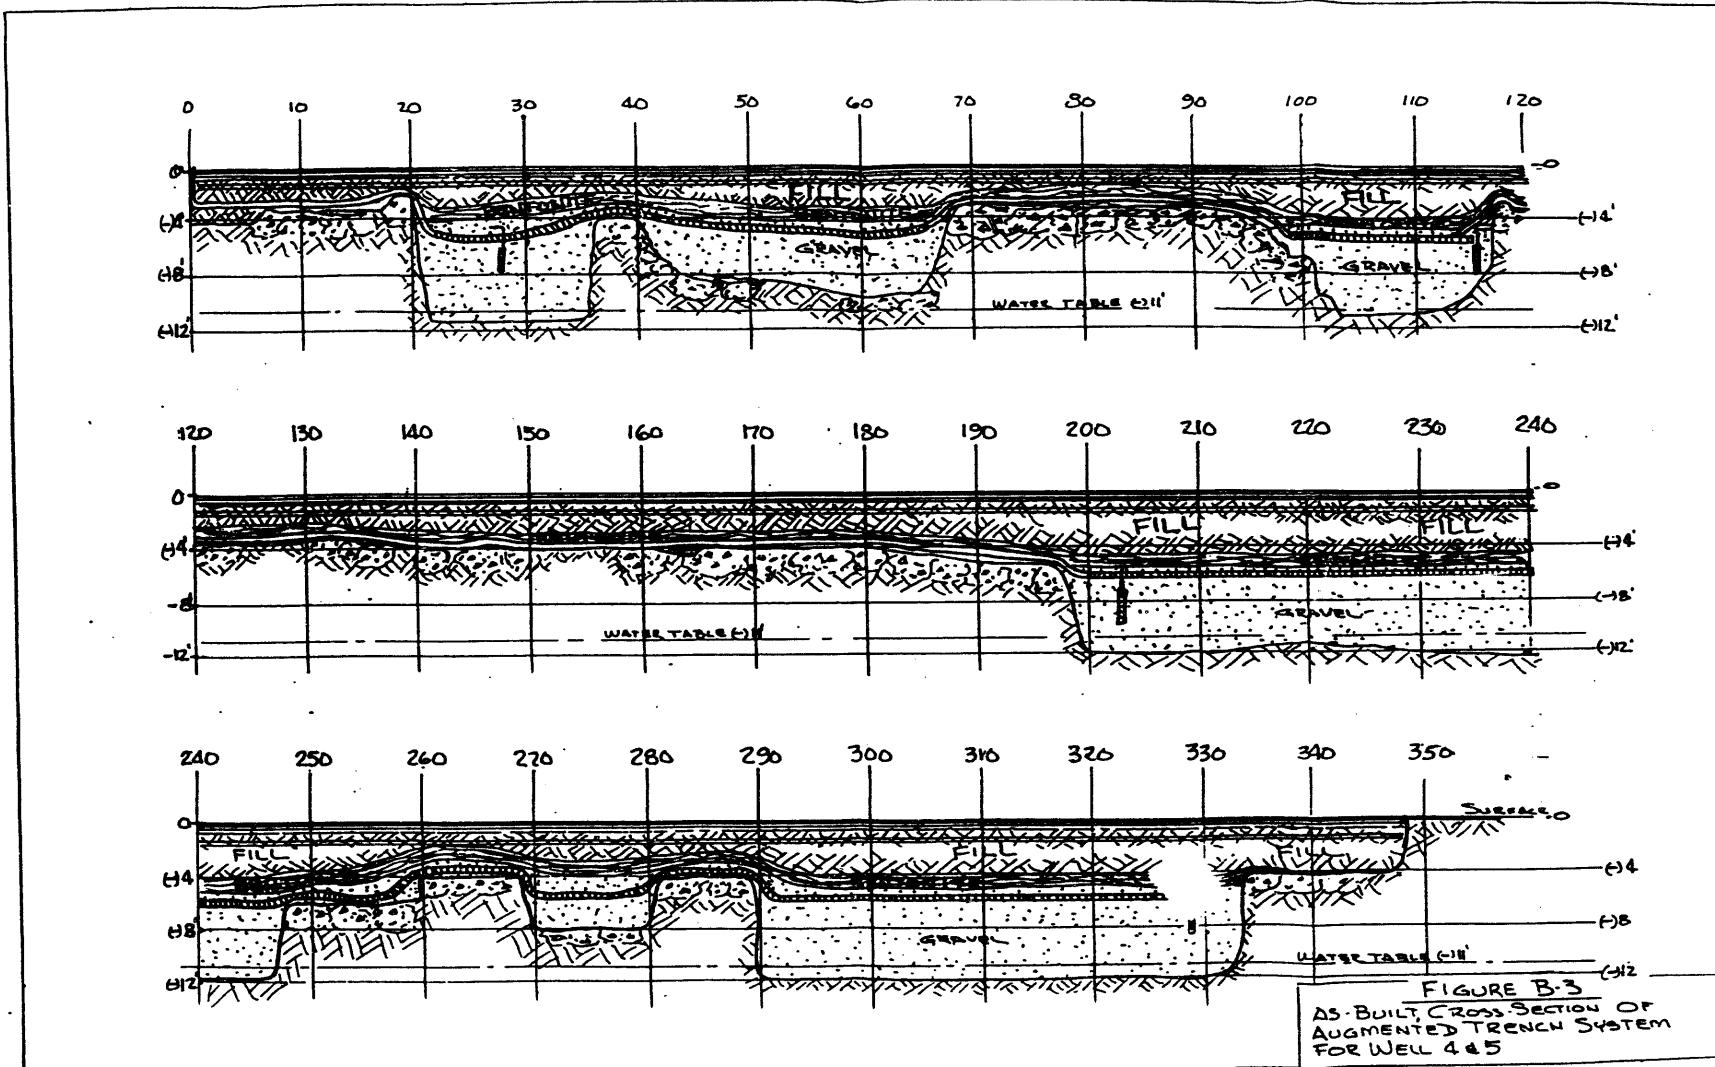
As-Built Cross Section of Augmented Trench System for Wells 4 and 5
